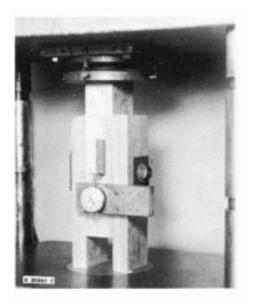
Assembly for Testing Bolted or Connectored Joint Parallel to Grain in Compression
